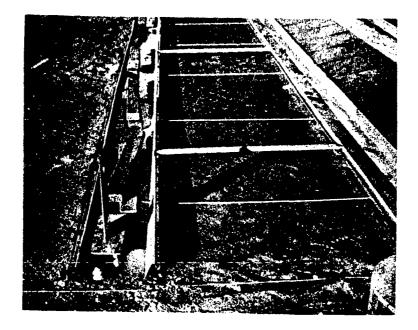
ALIGNING TROUGHS AND LOCATING WEIR CABLES
